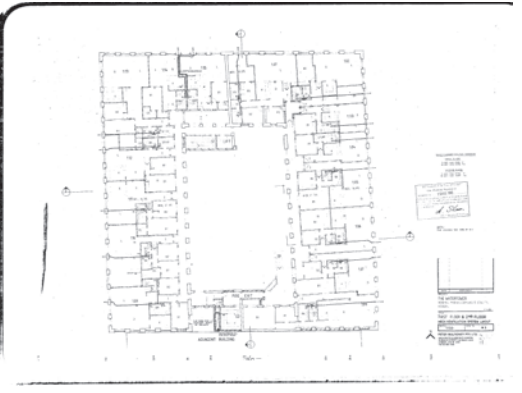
Third Floor Plan, Peter Mulrone Pty Ltd.
